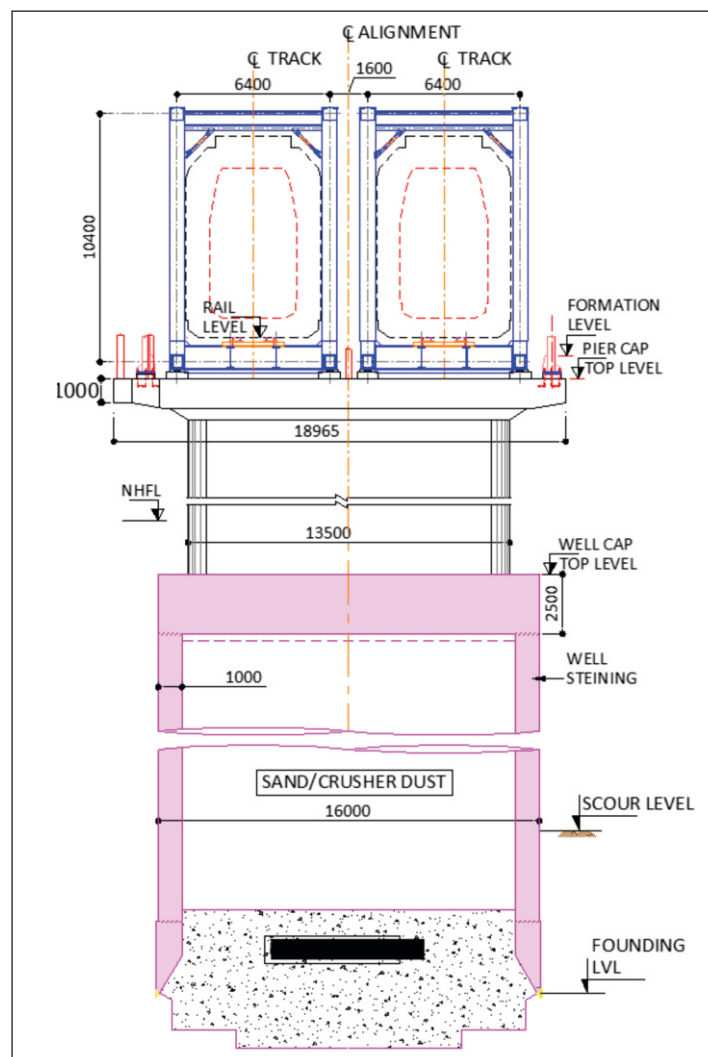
Typical Cross Section showing Pier and Well Foundation Dimensions
